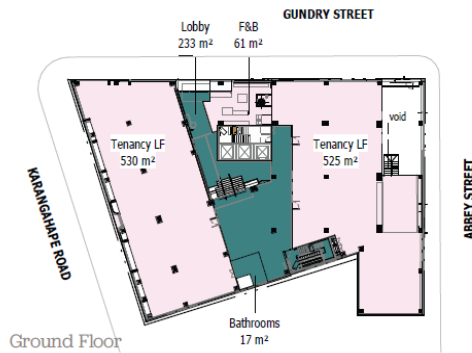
K ROAD MASS TIMBER COMMERCIAL BUILDING FLOOR PLANS
